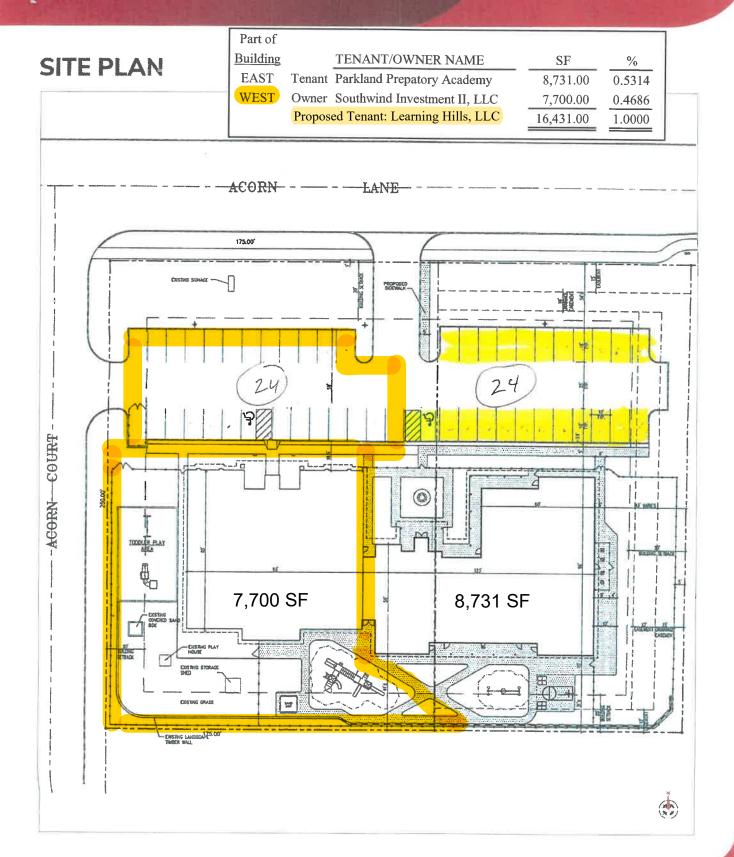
SITE PLAN and PARKING EXHIBIT 40 W. ACORN LANE, LAKE IN THE HILLS, IL
